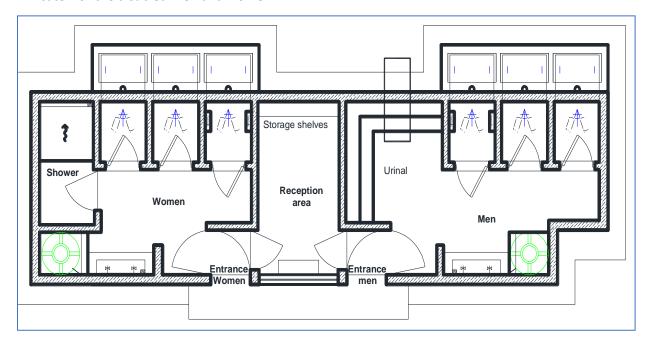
Layout of Proposed Public Water Borne Toilet
